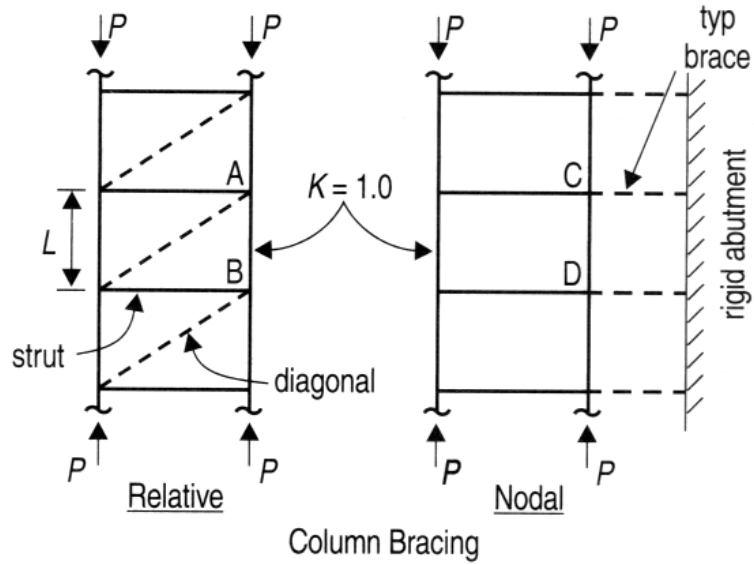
Types of Bracing (a) Relative Bracing and (b) Nodal Bracing
